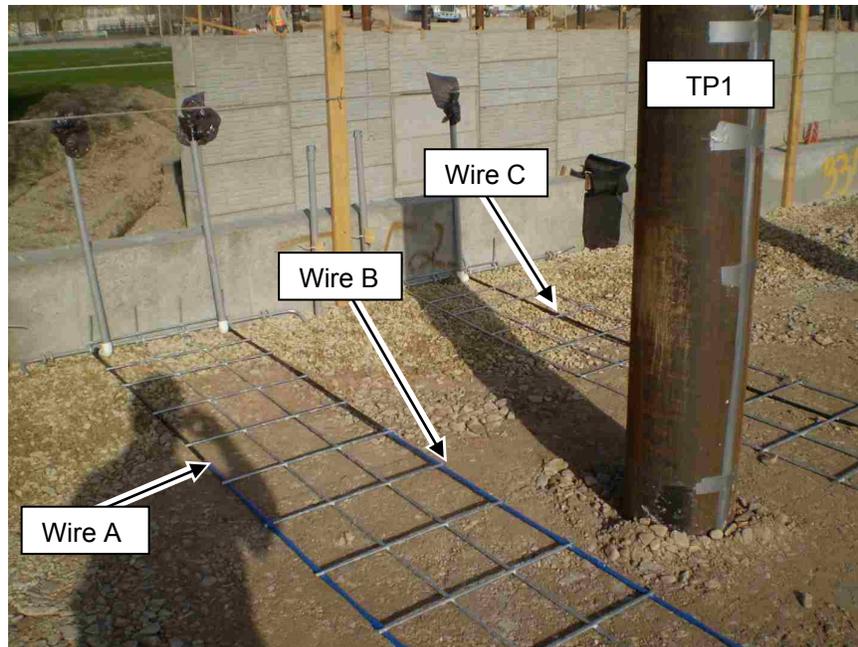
View of longitudinal wires that were instrumented near TP1 (U.S. Highway 89 site).
